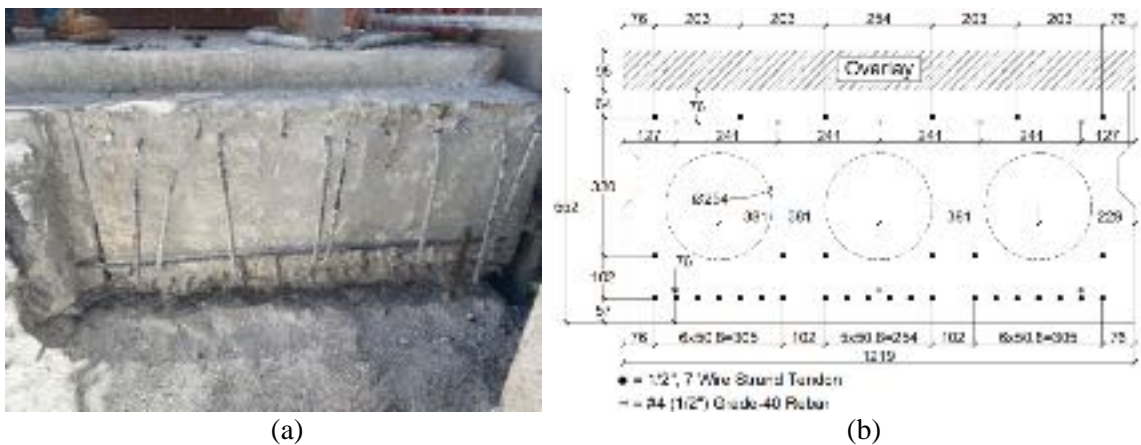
Cross-section of the exterior panel. (a) Excavation to the end face of the panel. (b) Cross-section detail.
